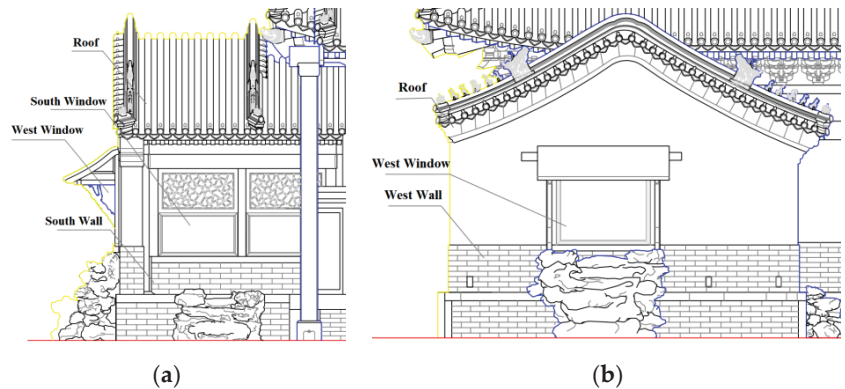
Elevation of a palace-style wooden ancient building in Beijing: (a) south elevation and (b) west elevation.
